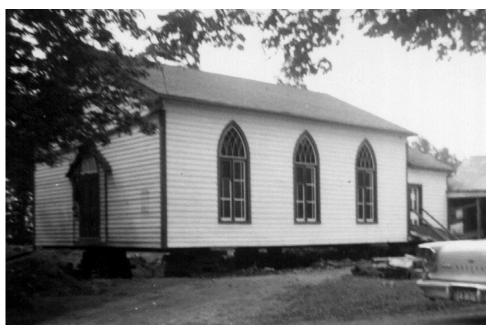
The church is raised on supports to dig out and construct the basement. The original doors remain in place inside the new front room (Brown 1961)
